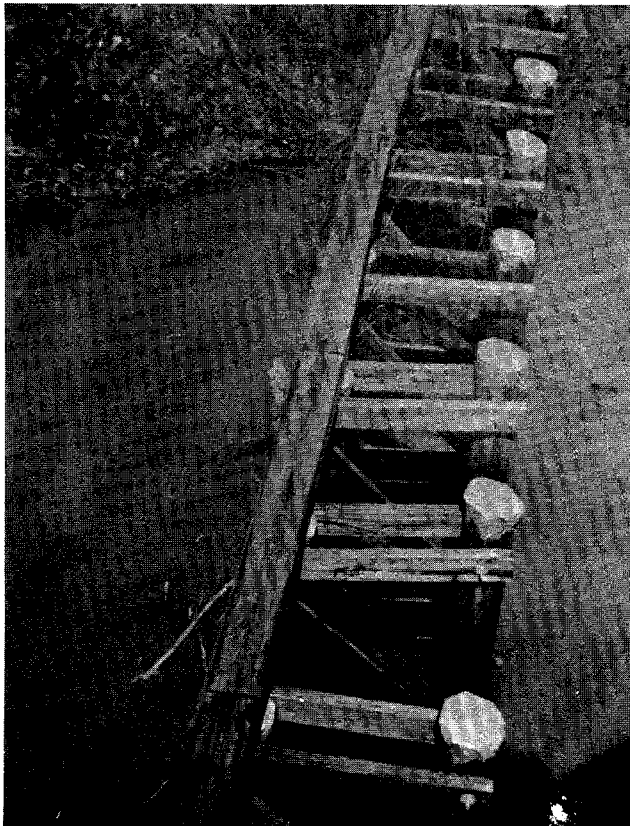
View of timber pile spur at old SR-28 bridge on March 25, 1969, looking toward east bank.
